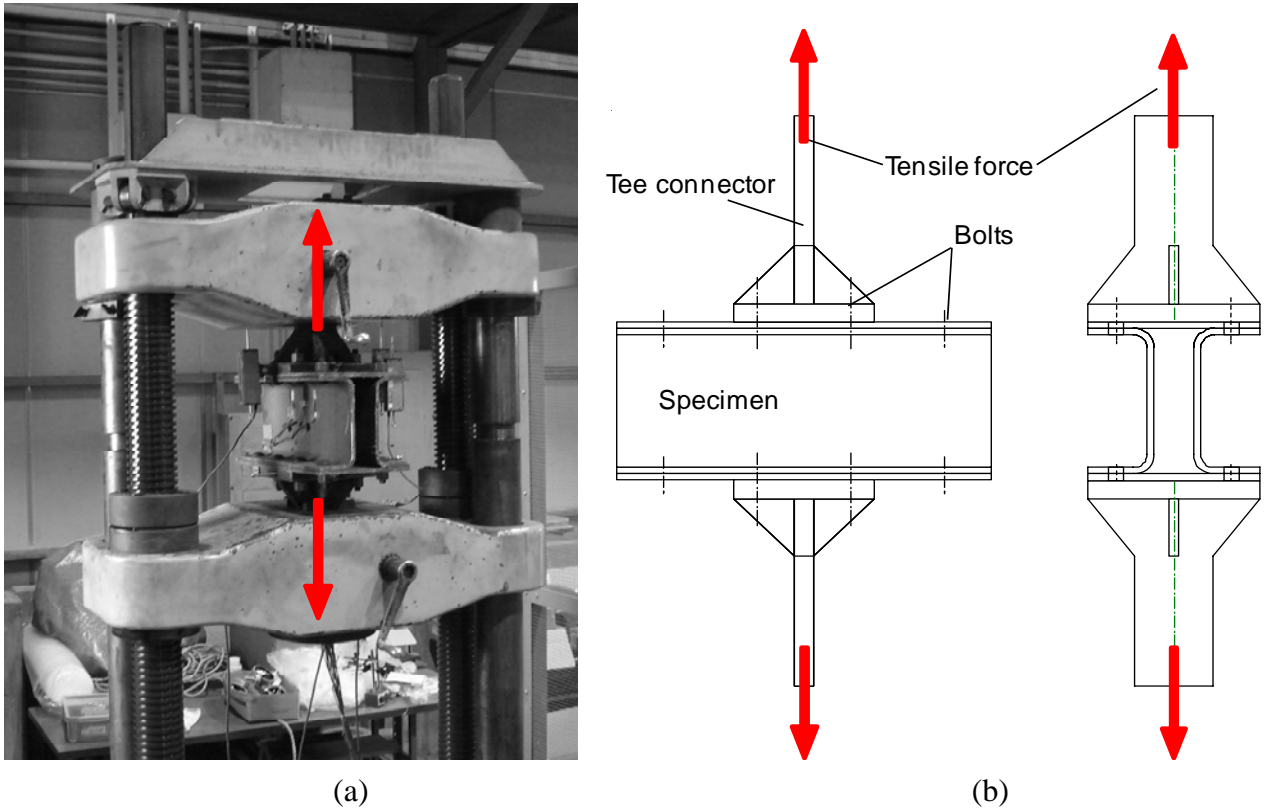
Test setup of local tension test: (a) testing machine and specimen; (b) drawings of the specimens and setup.
